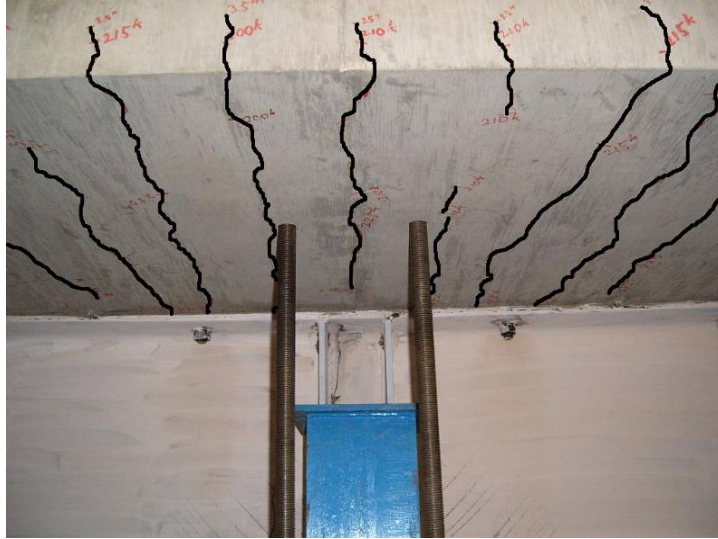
Specimen HASAA-30BS - Cracks on the bottom of the concrete slab (4.25-in deflection)
